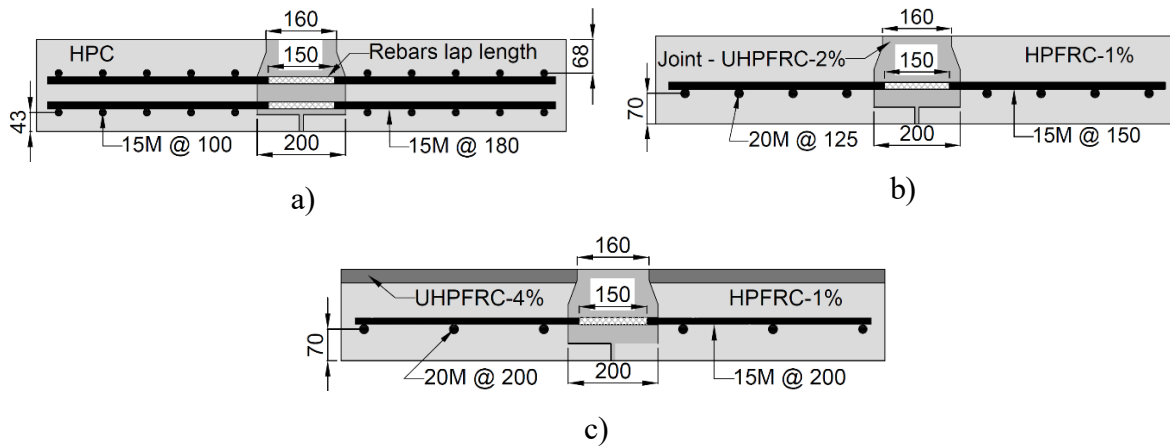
Deck cross sections with a transverse UHPFRC connection, a) HPC, b) HPFRC, c) Hybrid HPFRC and UHPFRC (dimensions in mm)
